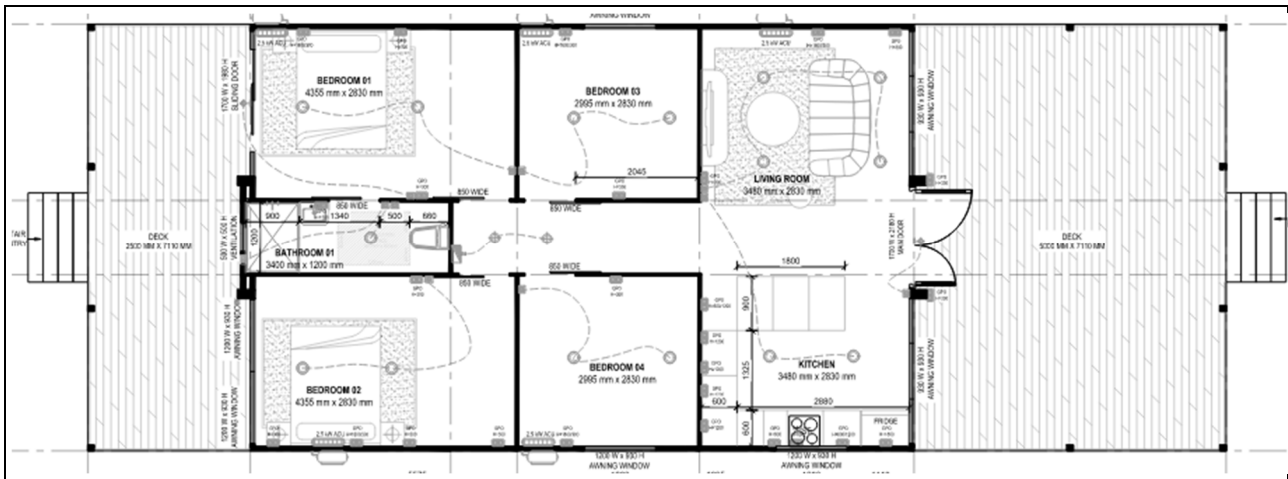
EXCERPT OF PROPOSED SITE PLAN
